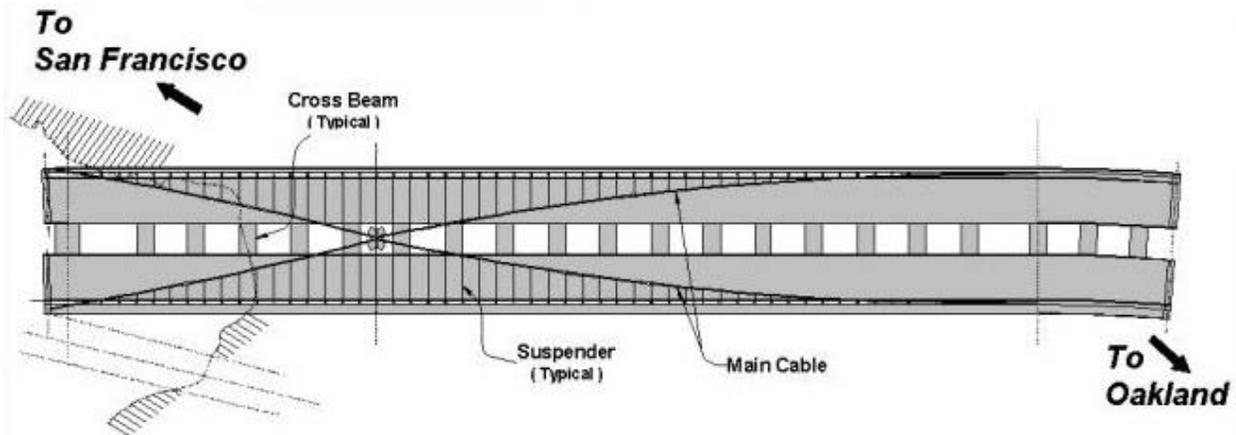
Plan view of the SFOBB Self-Anchored Suspension Bridge with steel box girders, cross beams and suspension cables.
